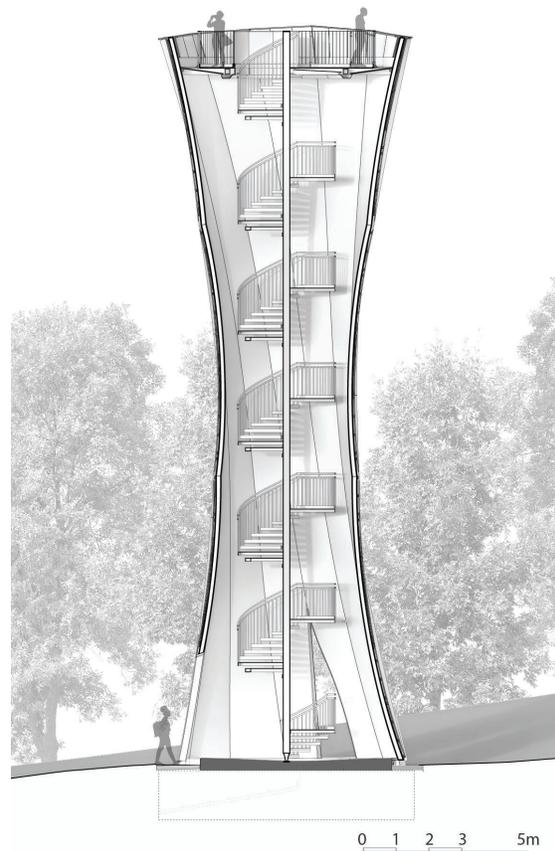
Section through the tower including the structural CLT skin, stair, and platform.
